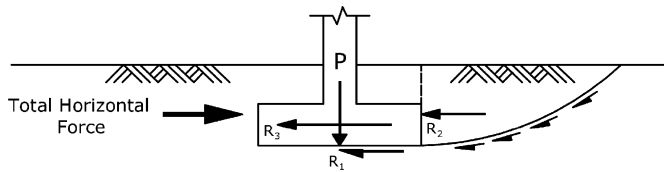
Footing horizontal capacity components considering failure at footing-soil-interface by sliding.
